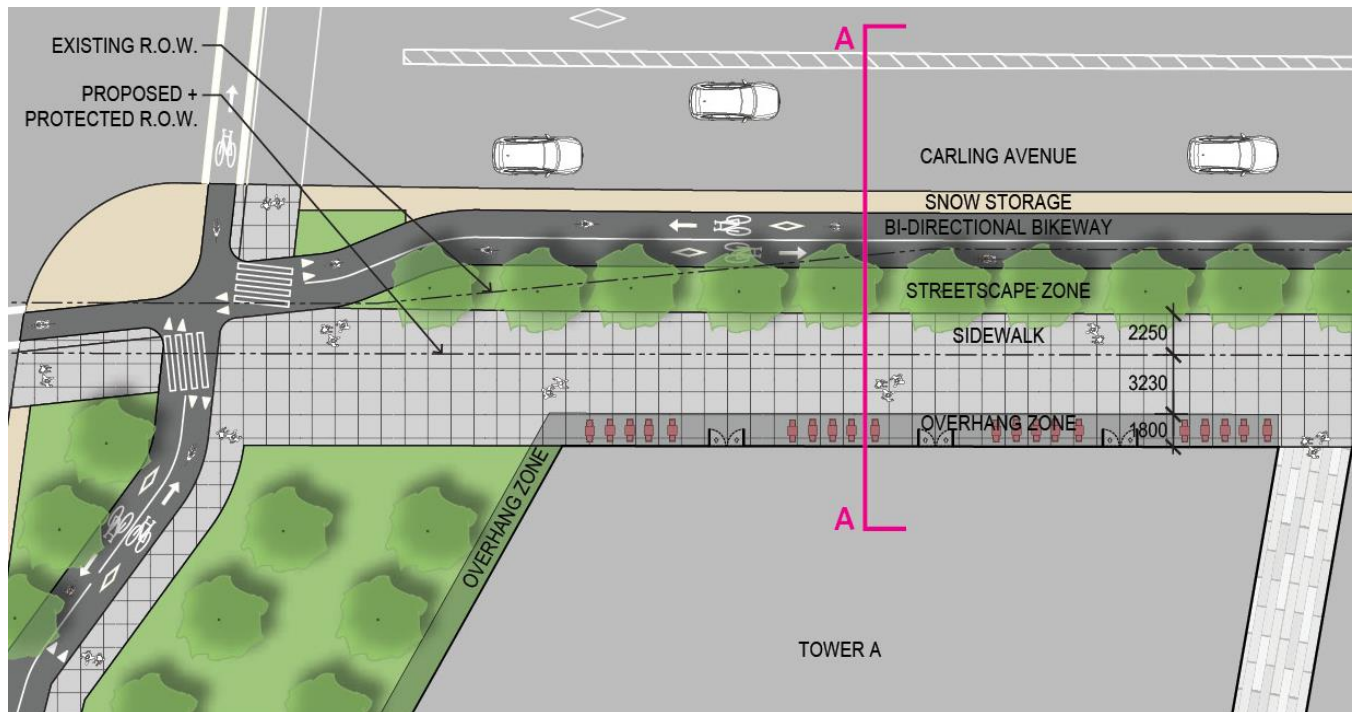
Public Realm Section at Tower 'A', Carling Avenue
